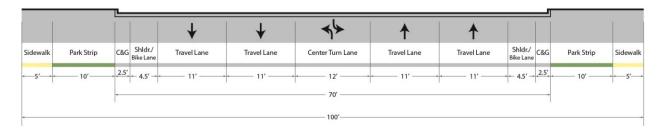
Cross Section, Minor Arterial (Five Lane)
